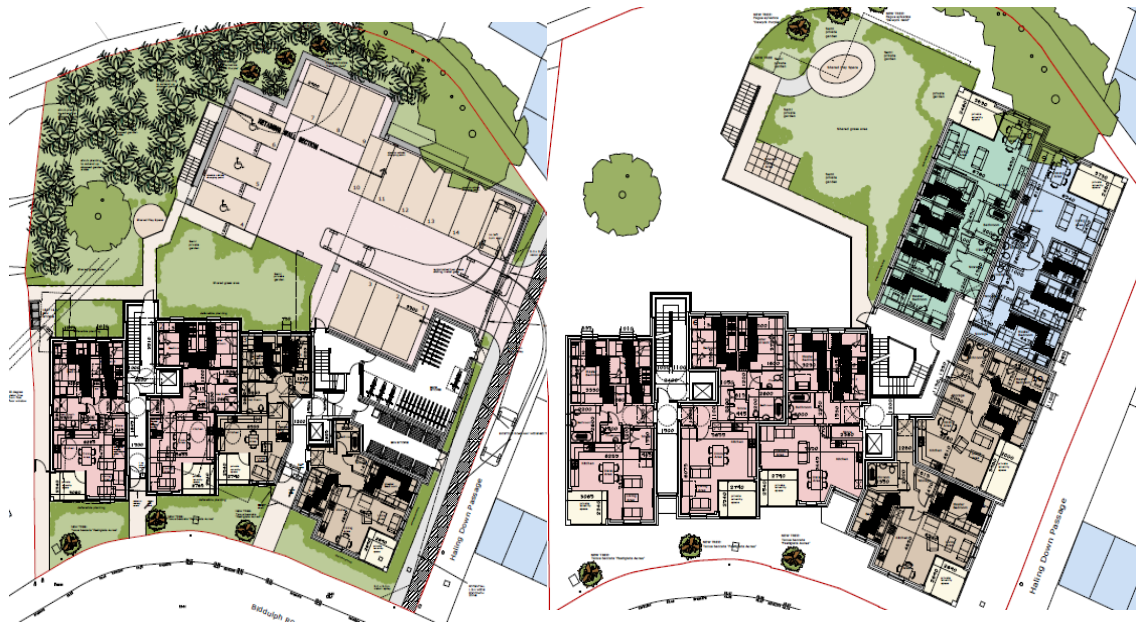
Site/Ground Floor Plan (left) and First Floor Plan (right)
